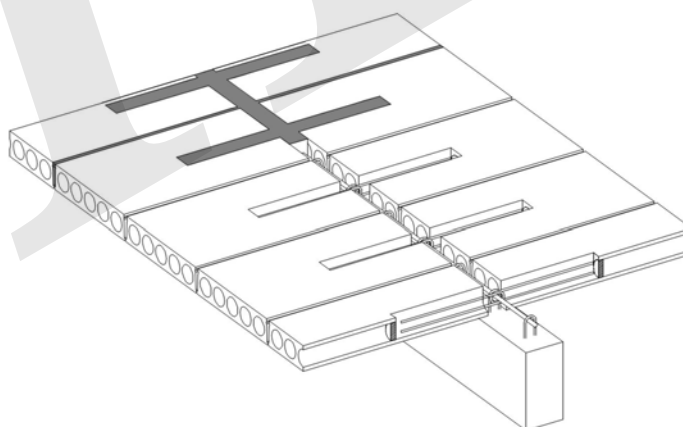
Untopped hollowcore slabs with small areas of insitu concrete along slab boundaries providing structural connections.
